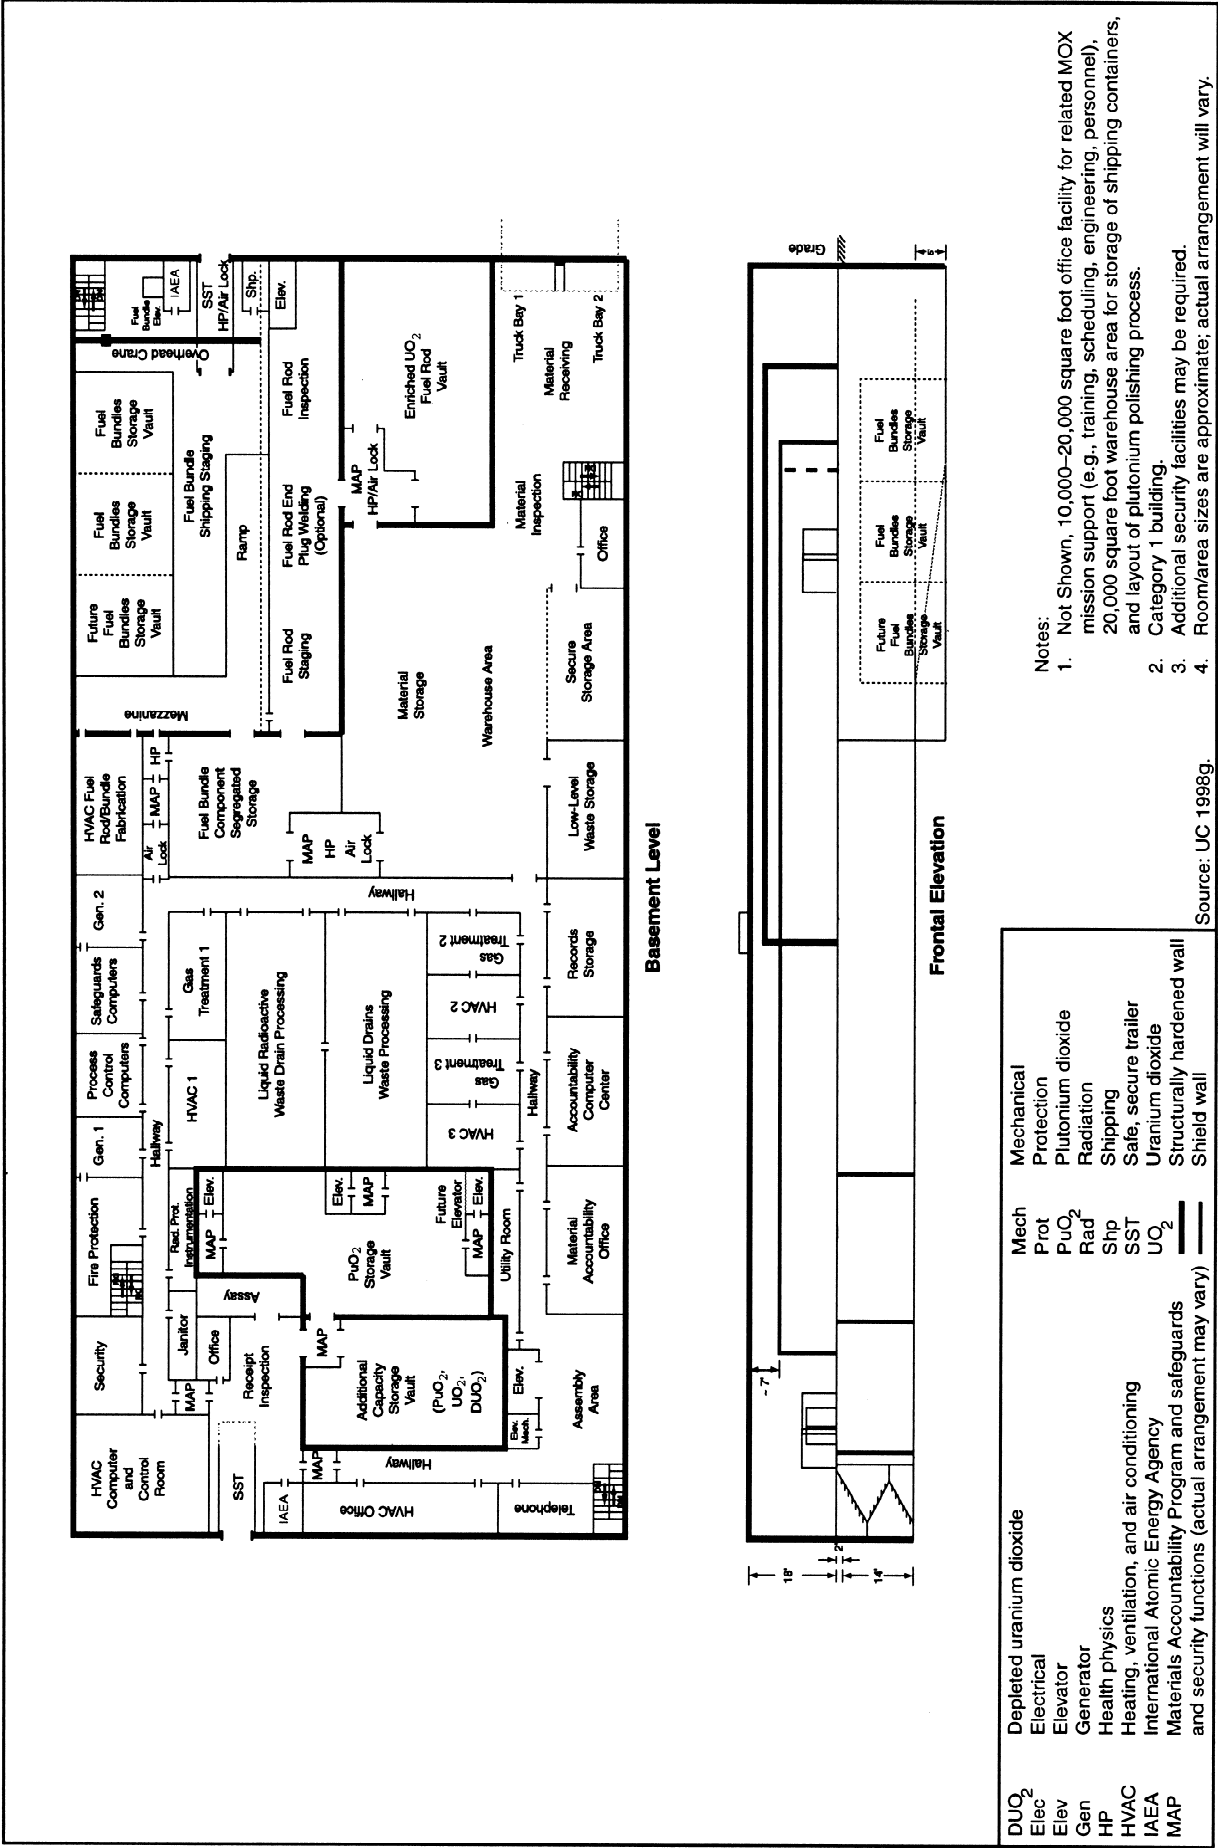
General Design of MOX Facility—Basement Level and Frontal Elevation
